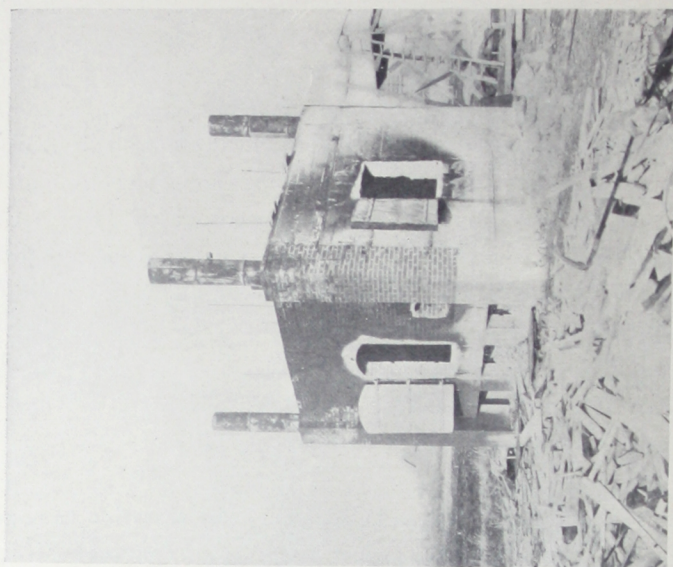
PLATE X. VIEW OF TEST BUILDING AFTER THE FIRE,
